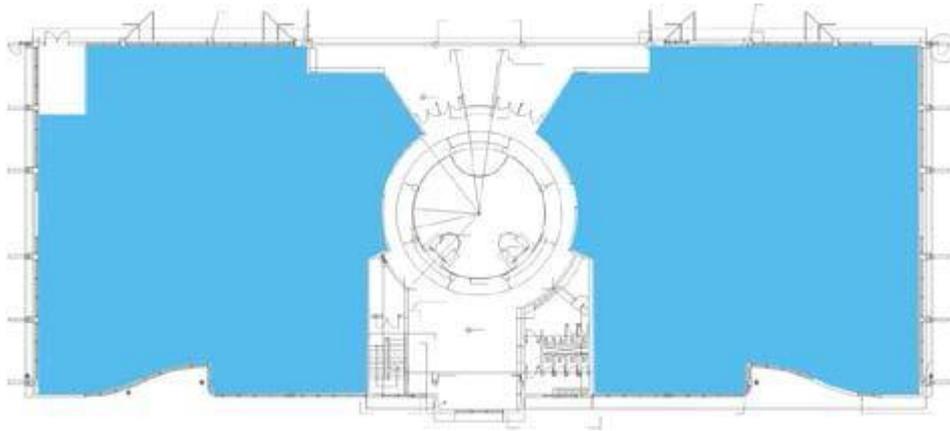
Second floor plan of Ceddi Plaza, Abuja.
